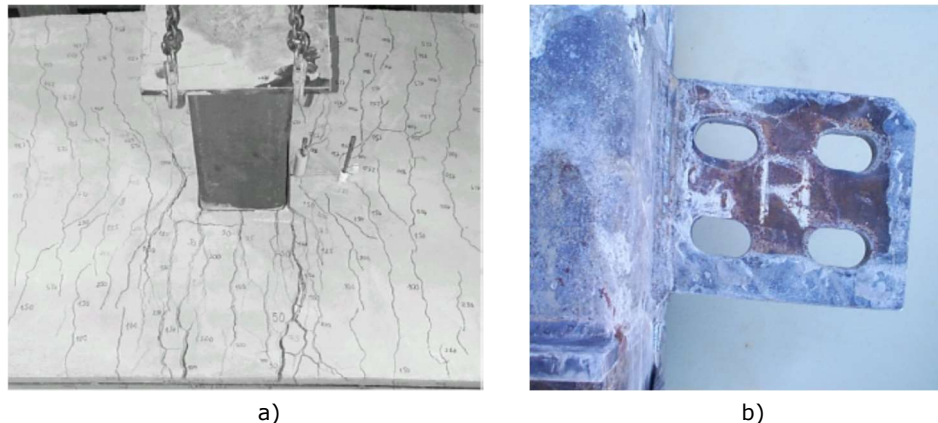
Details regarding the failure mode of the composite specimens from Malaska [31]: a) concrete crack pattern; b) deformation of the steel shear plate
